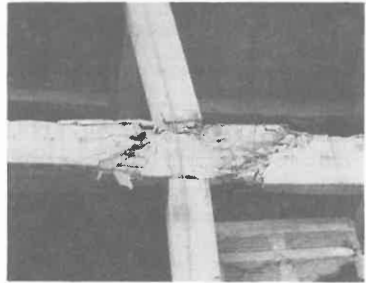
IV) Failure of longitudinal steel in a beam. This type of damage is much less common than brittle type failure of heavily reinforced concrete.
